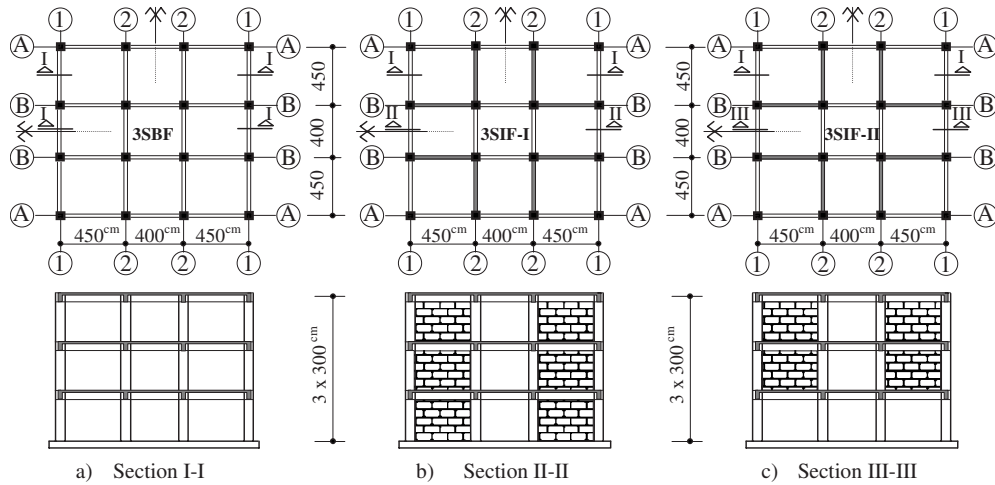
Plan and sections of the RC buildings with and without infill walls
